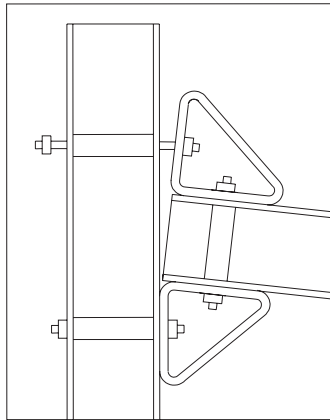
Local failure of 6 in. \times 1/2 in. wrapped angle connection detail. Source: Bank et al. (1994).
